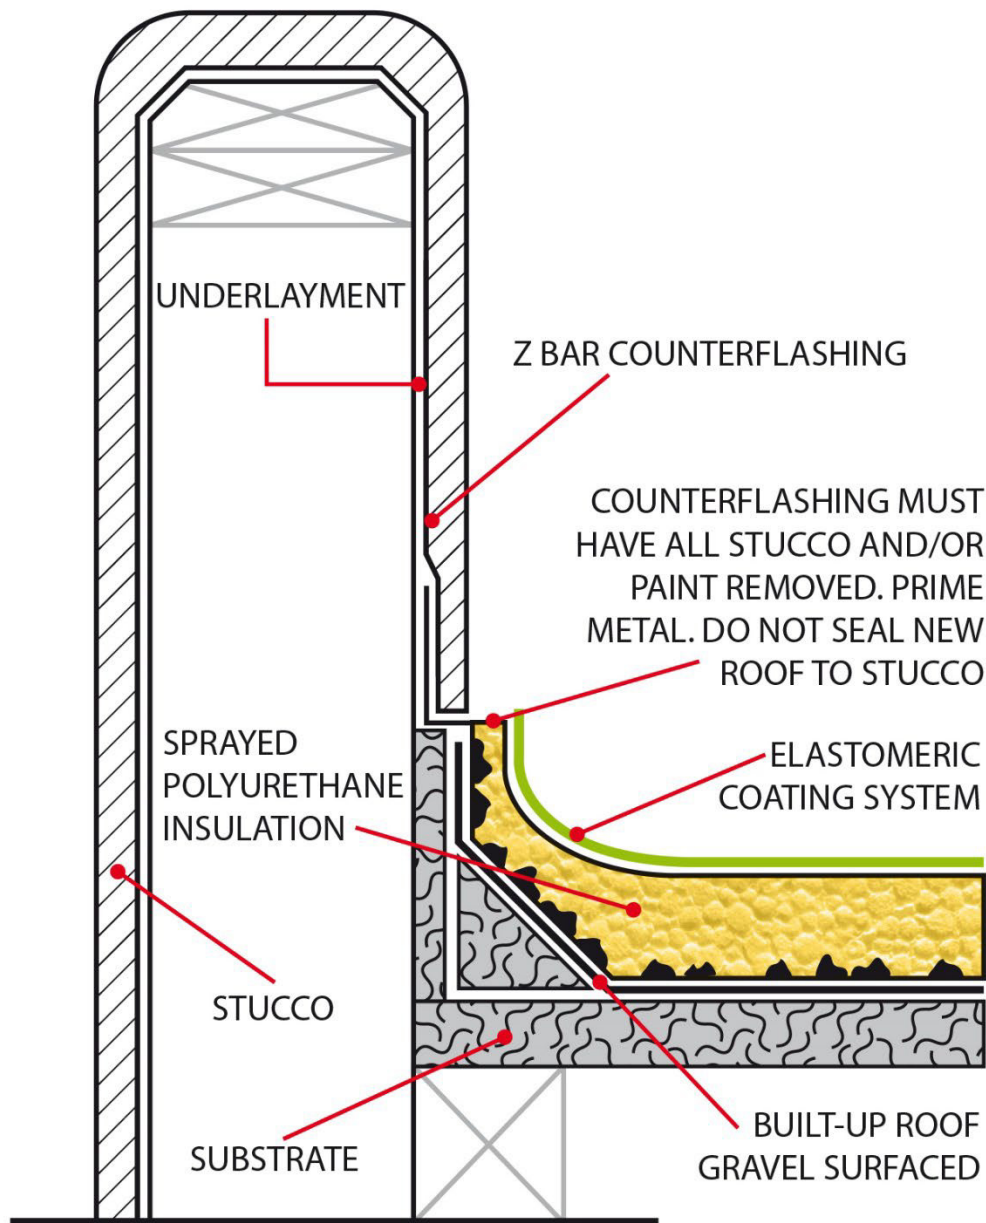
, EXISTING PARAPET WITH SURFACE MOUNT COUNTERFLASHING
